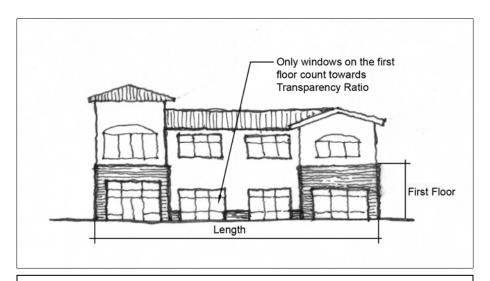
Clear glass windows and door along the first floor of a building promote pedestrian interest.
